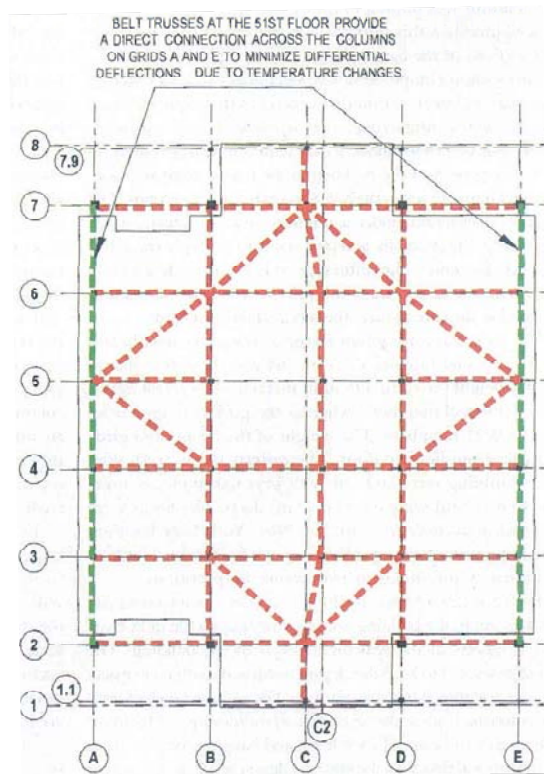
Thermal Truss, in green, located at the 28th and 51st floor, courtesy of Thornton Tomasetti
